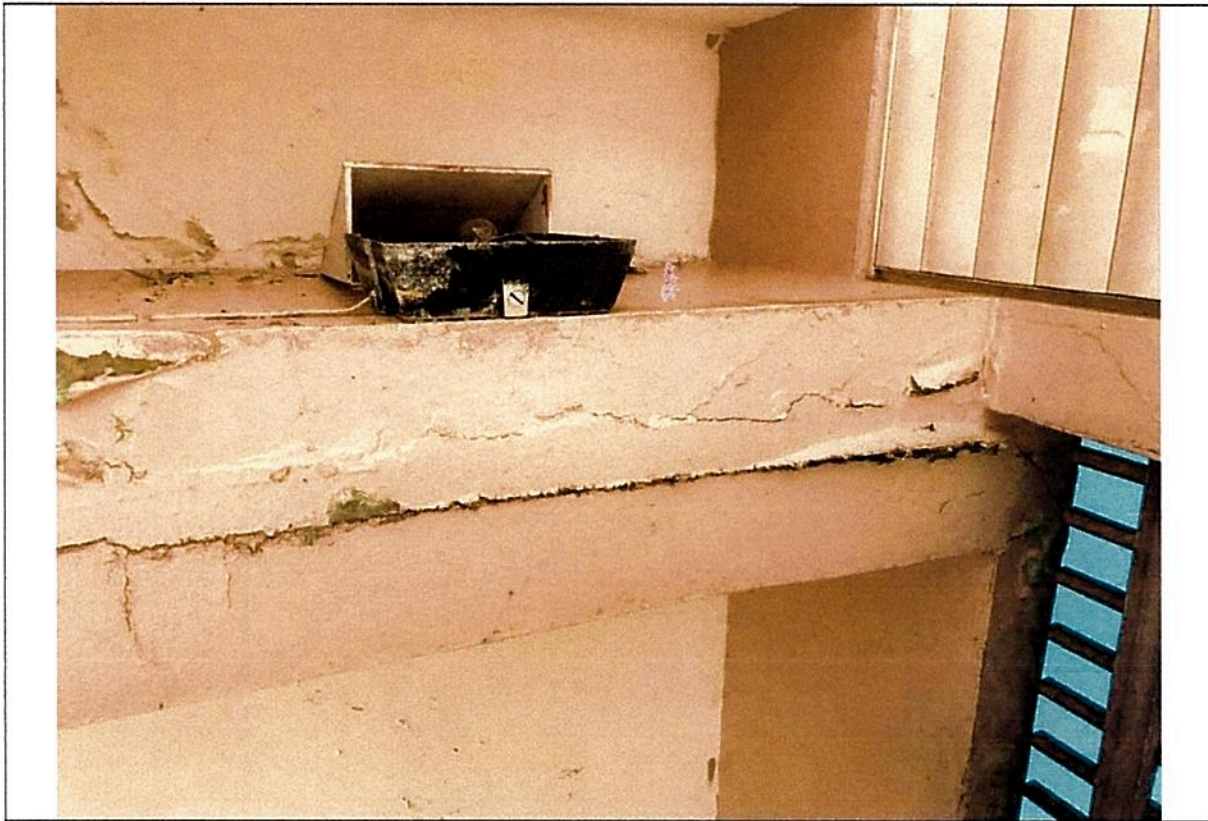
Concrete Delamination or Spalling at borders or local areas
